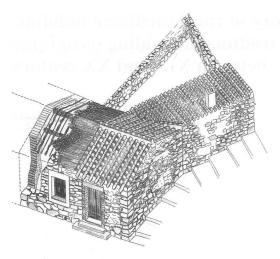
Traditional stone house made of basalt erratic blocks in Bauladu (western Sardinia)
